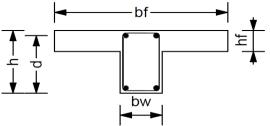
3: Flanged T-beam for beam D-D without dimensions
